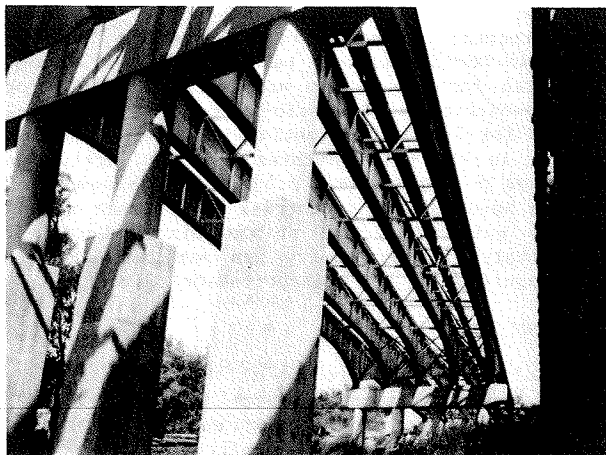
Fifth Street Bridge, Lynchburg, Virginia (under construction).
